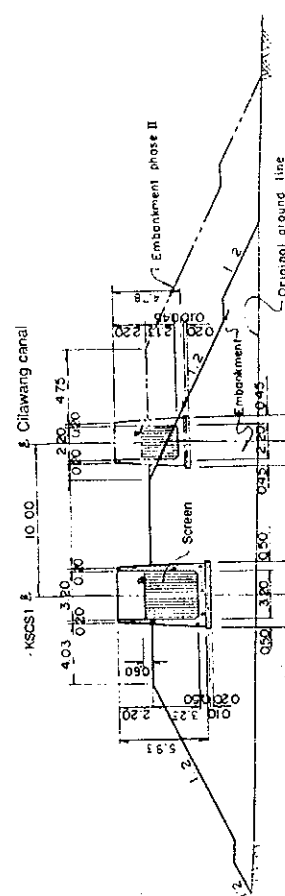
PLAN AND PROFILE OF PUMP STATION AT PARUNGPANJANG
